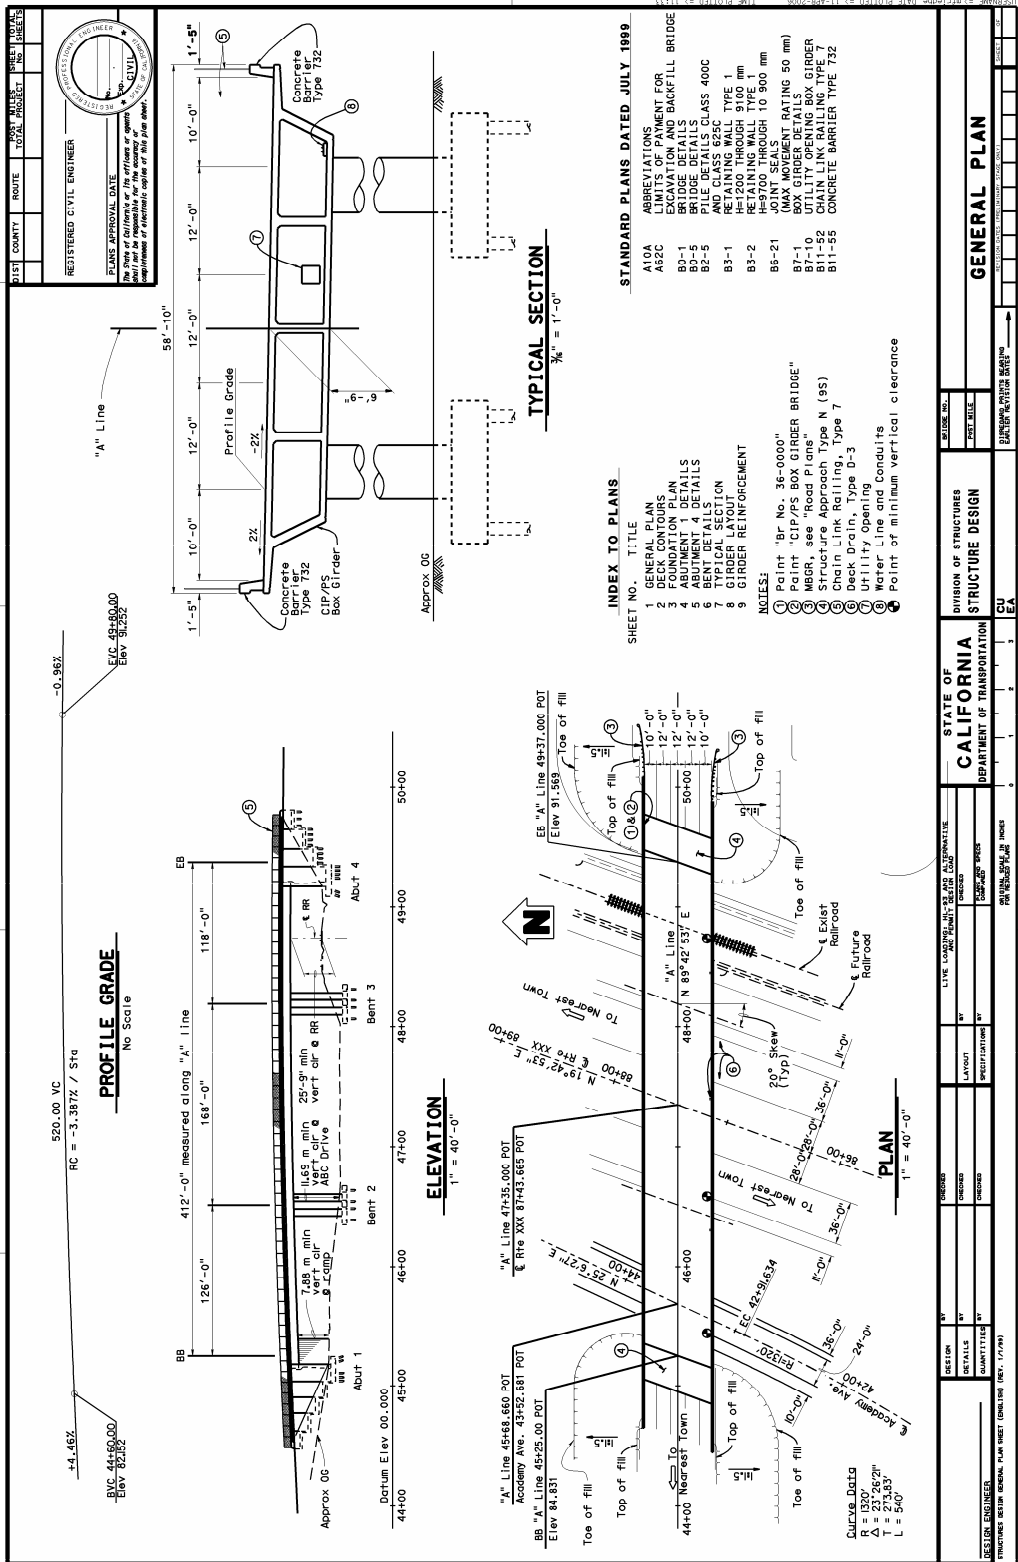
General Plan (Bridge Design Academy Prototype Bridge)
